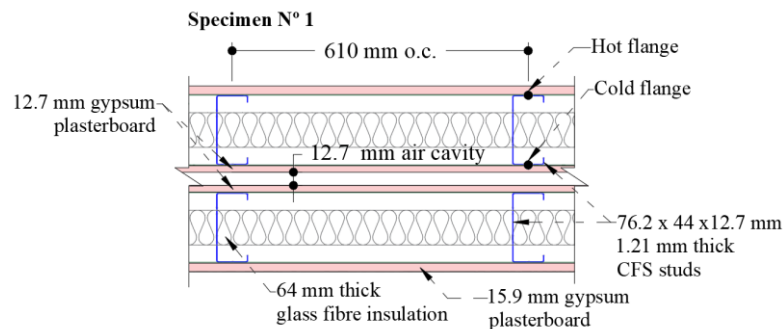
Double row stud wall tested by Shoub and Son (1973).
